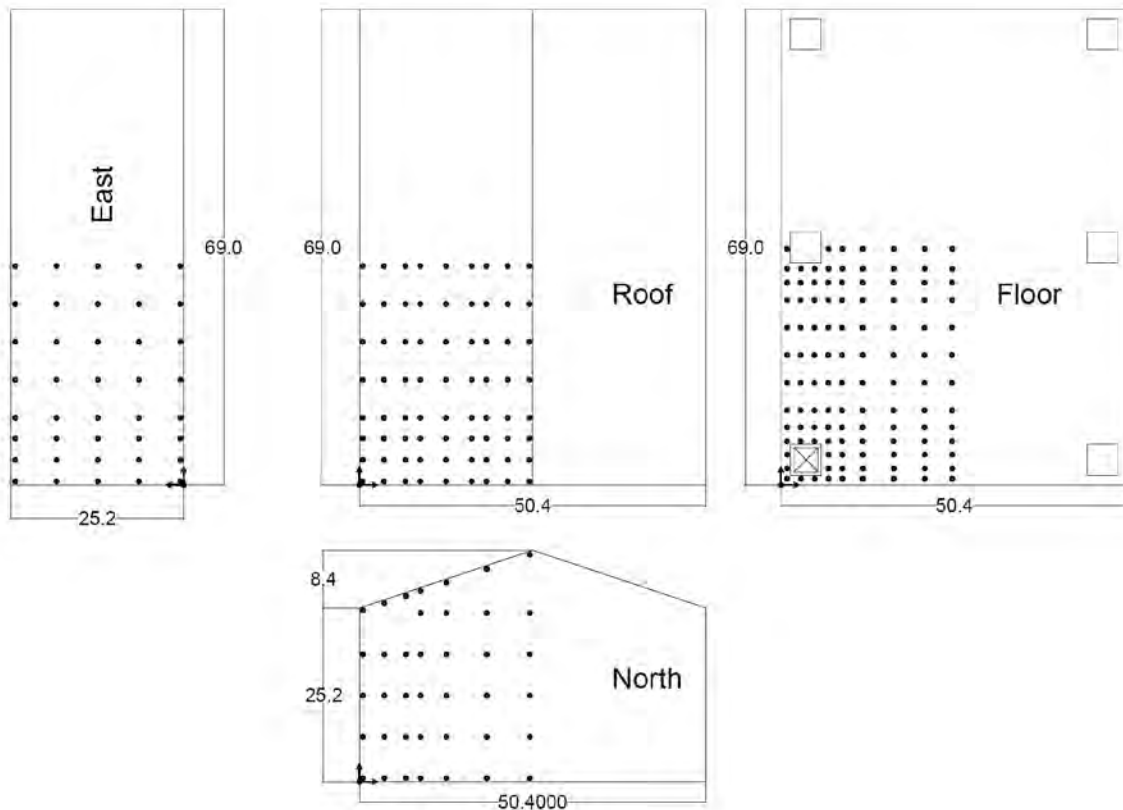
1:5 Scaled elevated house outer dimensions and tap location (Dimensions in inches)
